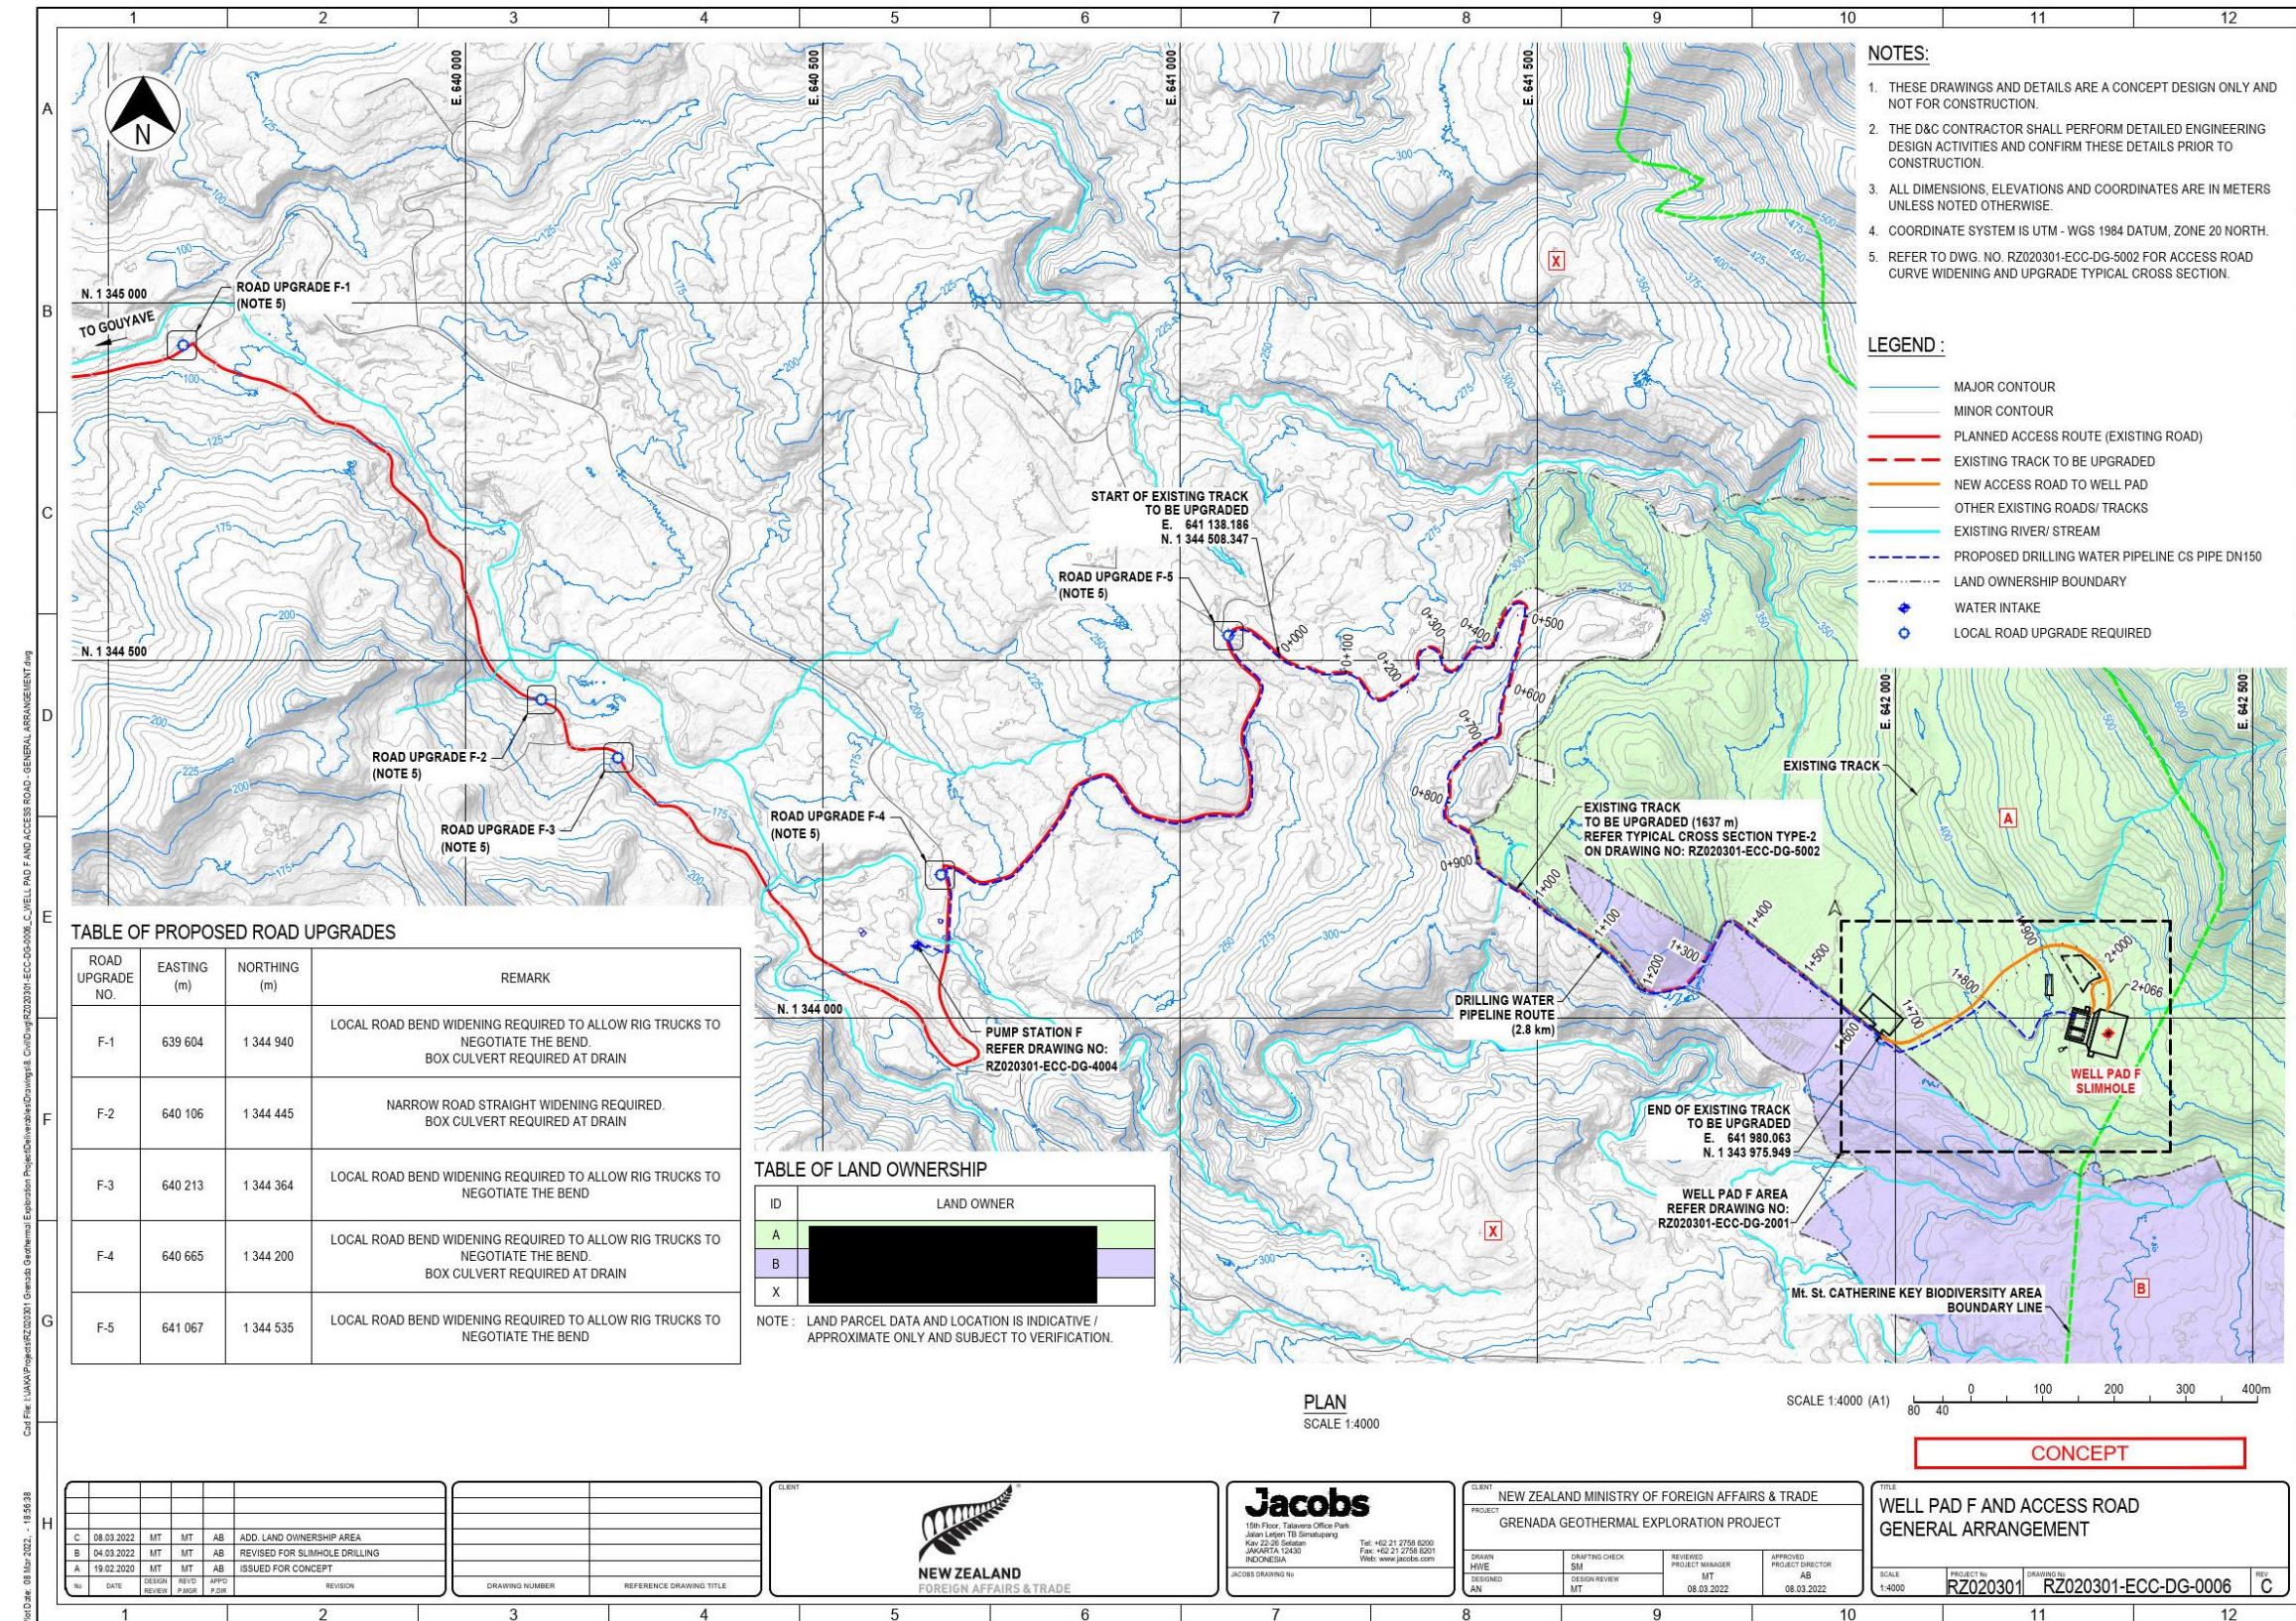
Access road general arrangement (site C) - concept layout plan
